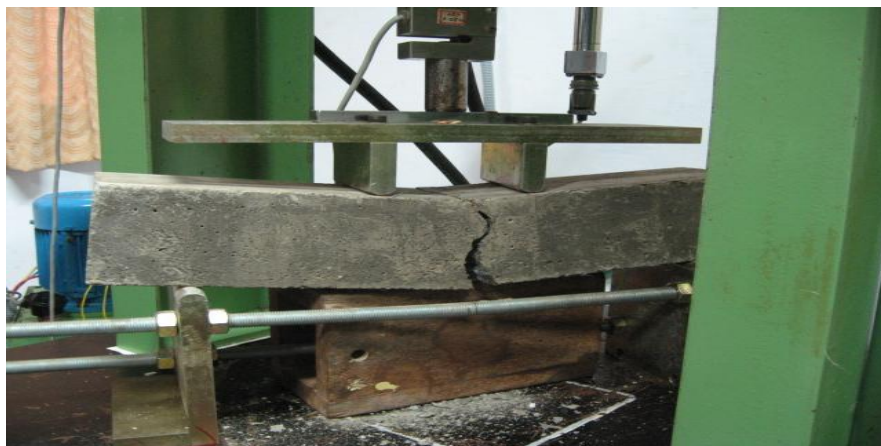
Failure mechanism of beam under flexural fatigue test
